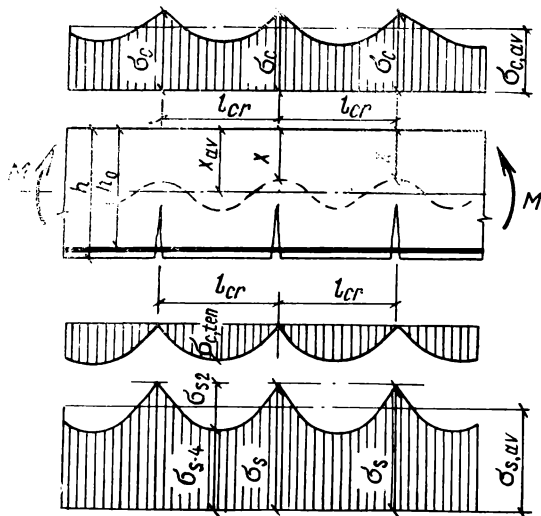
Neutral axis of a cracked bending reinforced concrete member
